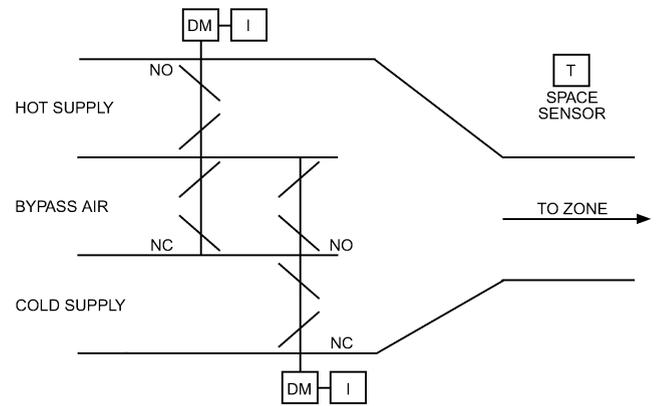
Zone Mixing Dampers—Three-Deck Multizone System
